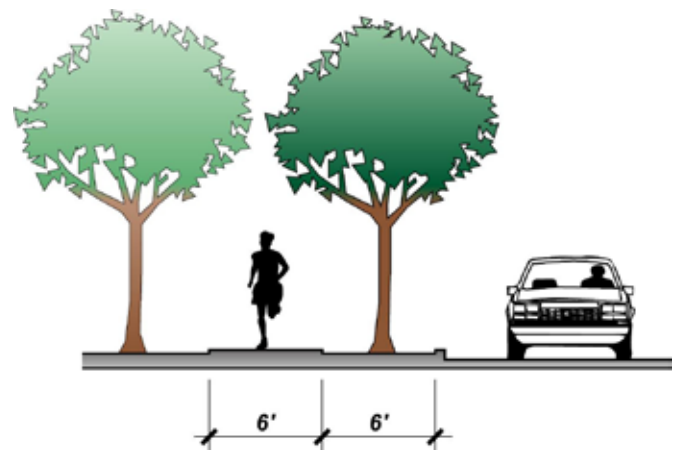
Sidewalk provided along the south side of Nelson Road.
